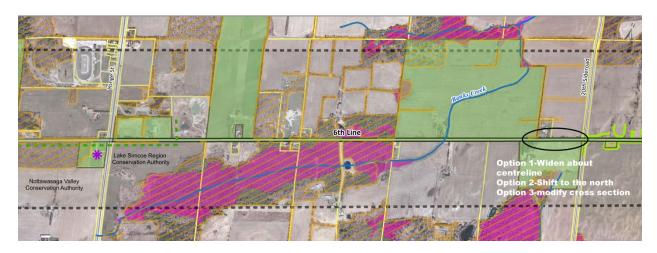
Sub-Section 2-9: West of 20 Sideroad to 20 Sideroad
